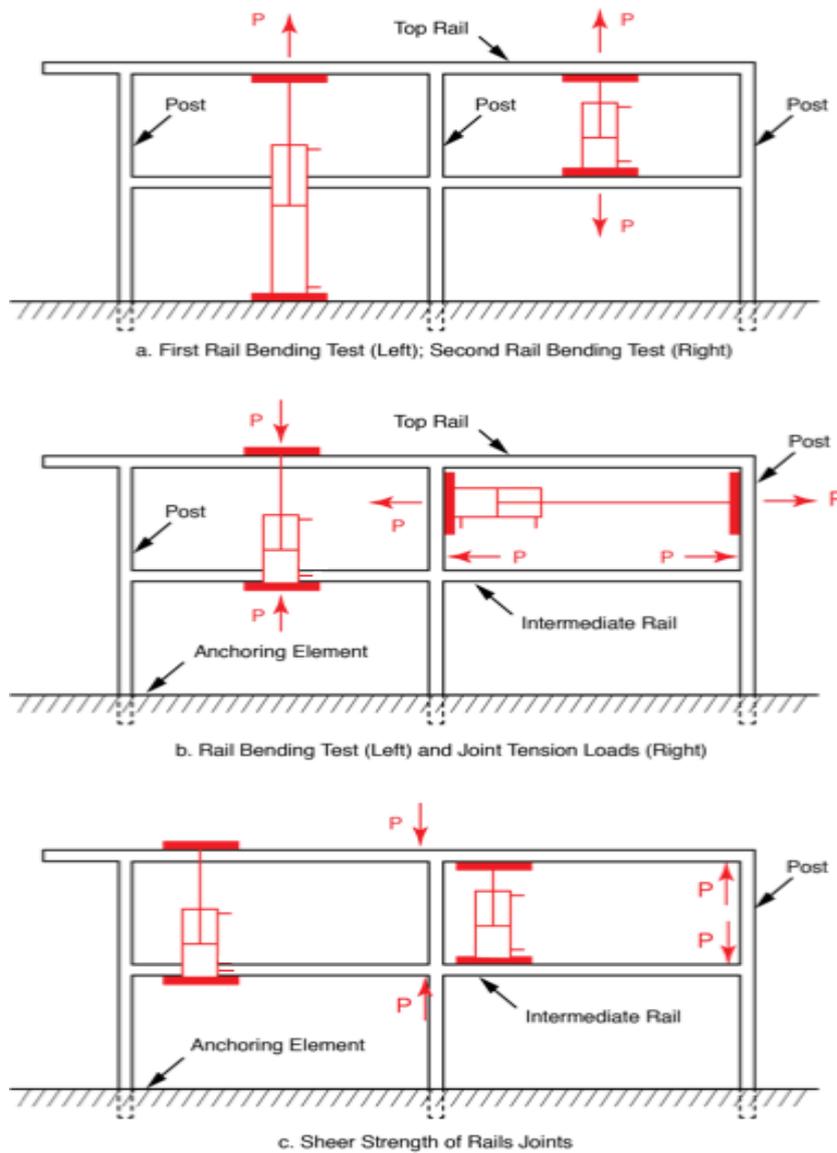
In-Plane Bending, Shear, and Tensile Tests of Guardrail Members
